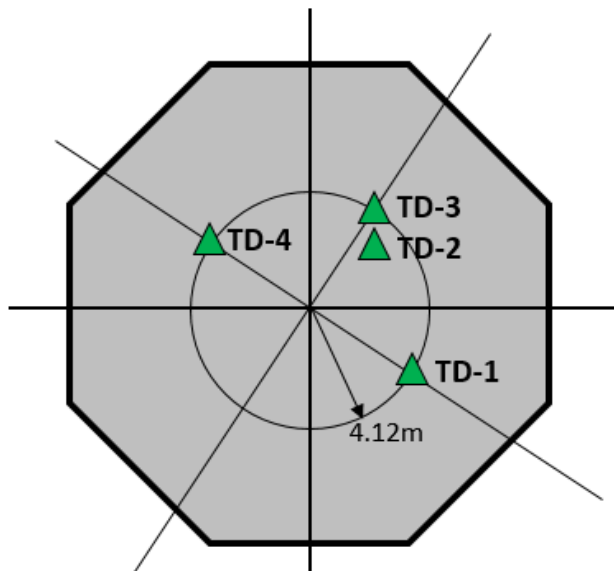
Layout of the thermal dissipation sensors beneath the foundation.
